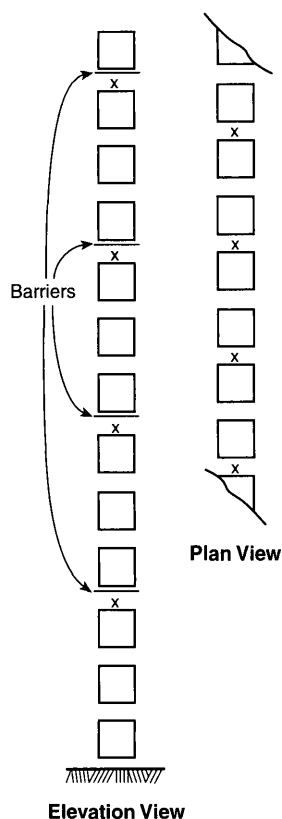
(a) In-Rack Sprinkler Arrangement, Group A Plastic Commodities, Single-Row Racks, Storage Height Over 25 ft (7.6 m) — Option 1.
